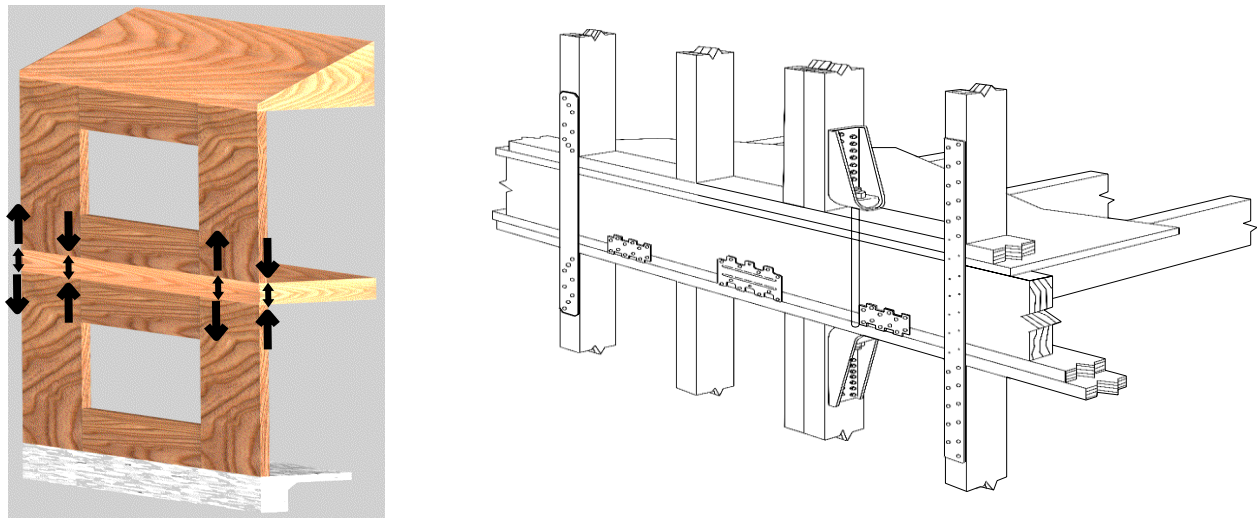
Overturning load path for shear walls (Figure credit: FEMA P-1052)
